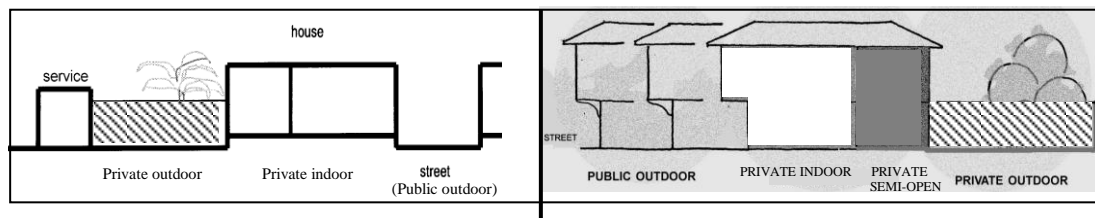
private courtyard at the back of the building (adapted from Oktay, 2001 and Pulhan, 2008)
